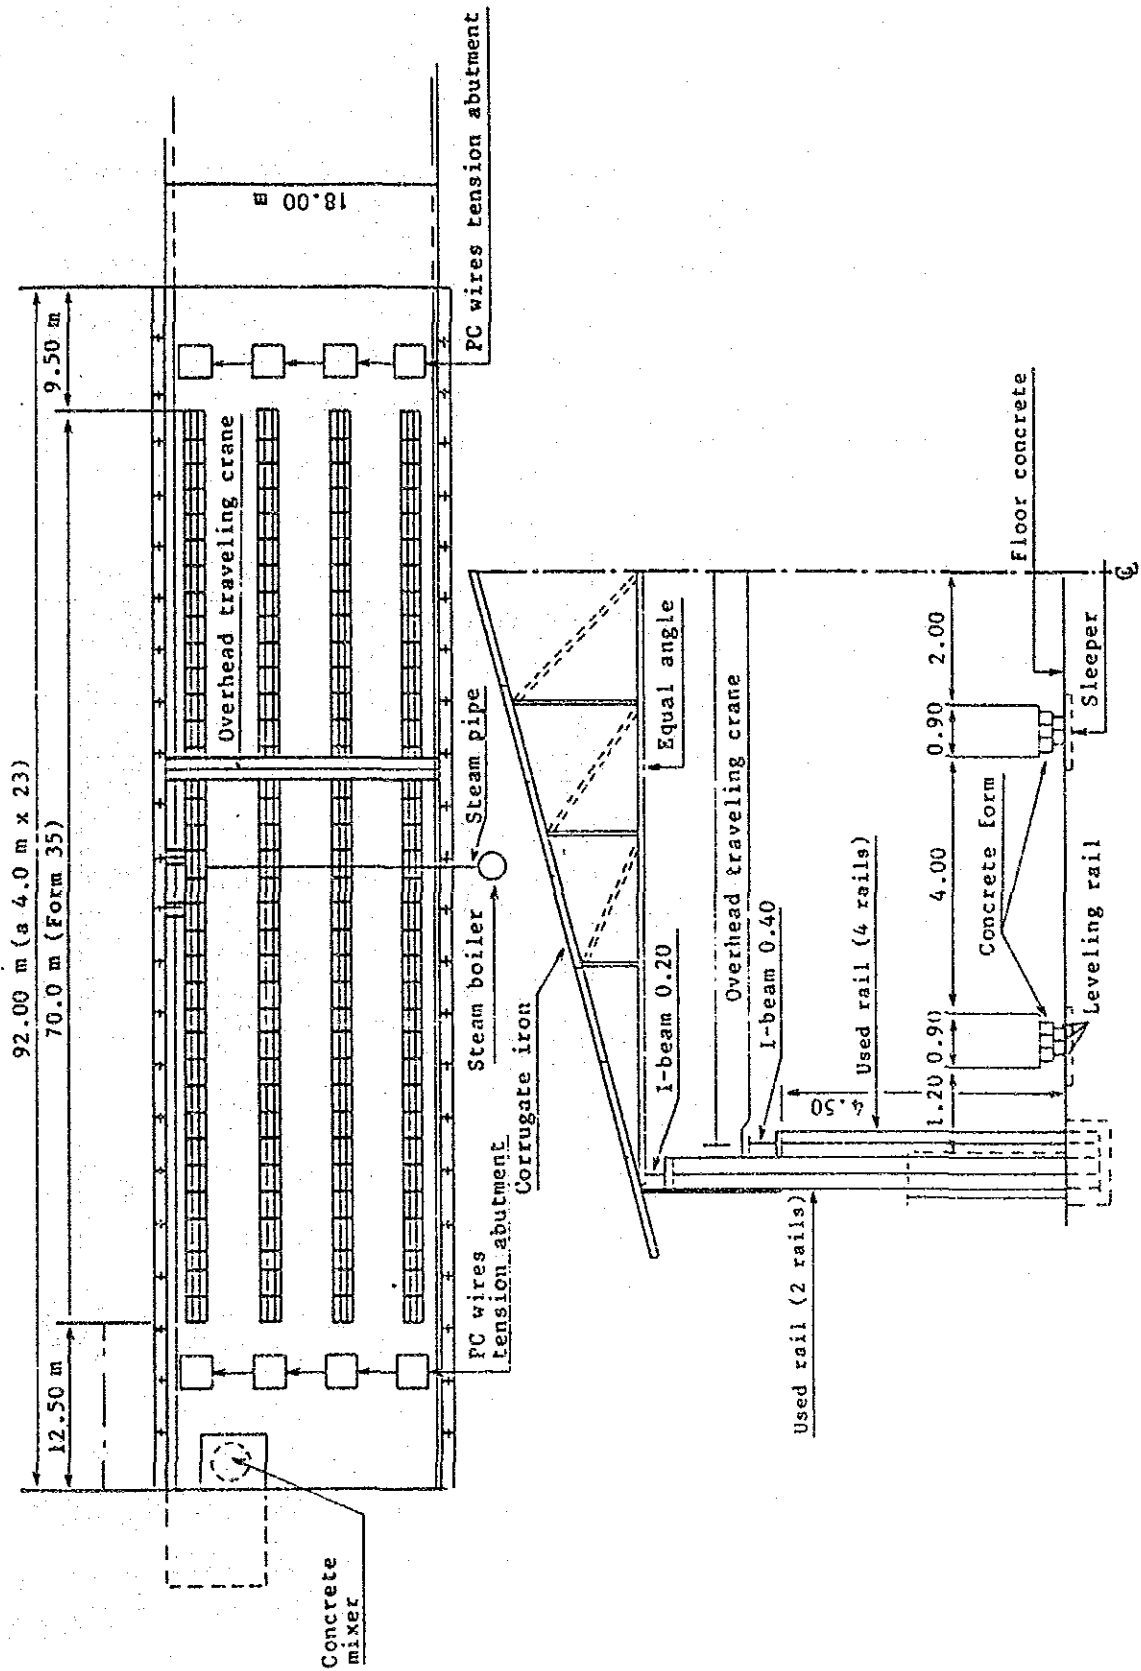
Typical PC Sleeper Factory (Pretention) Layout
